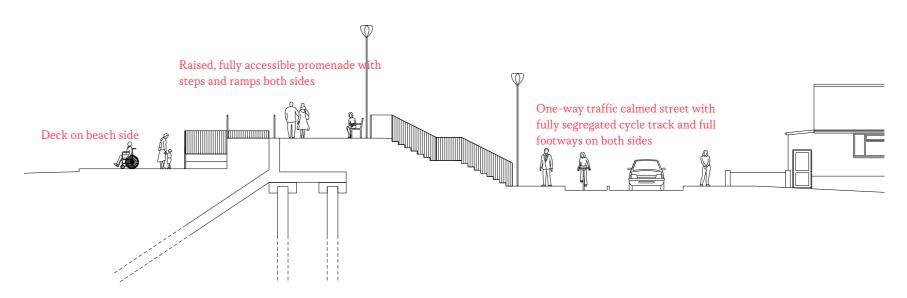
Indicative cross-section showing the strategic design approach to the Brooklands seafront.
